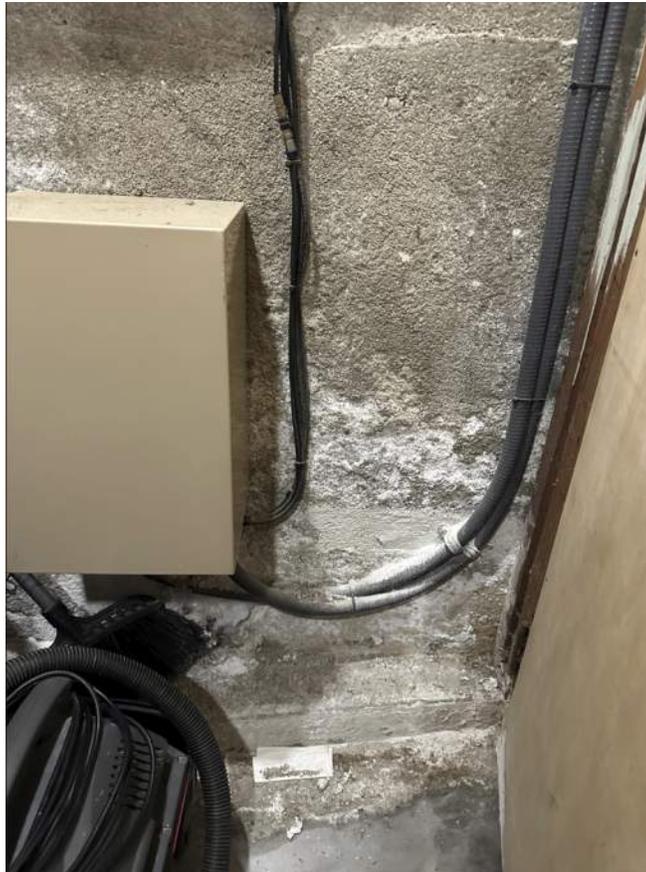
Efflorescence and Weak Concrete in South Wall of Pre-1957 Structure
